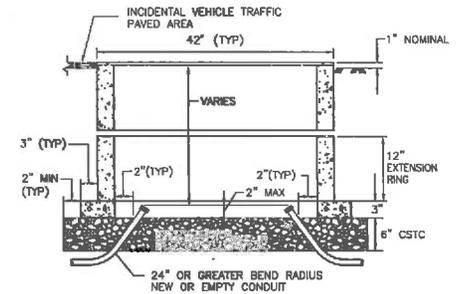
REPLACEMENT AND RECONFIGURATION DETAIL
